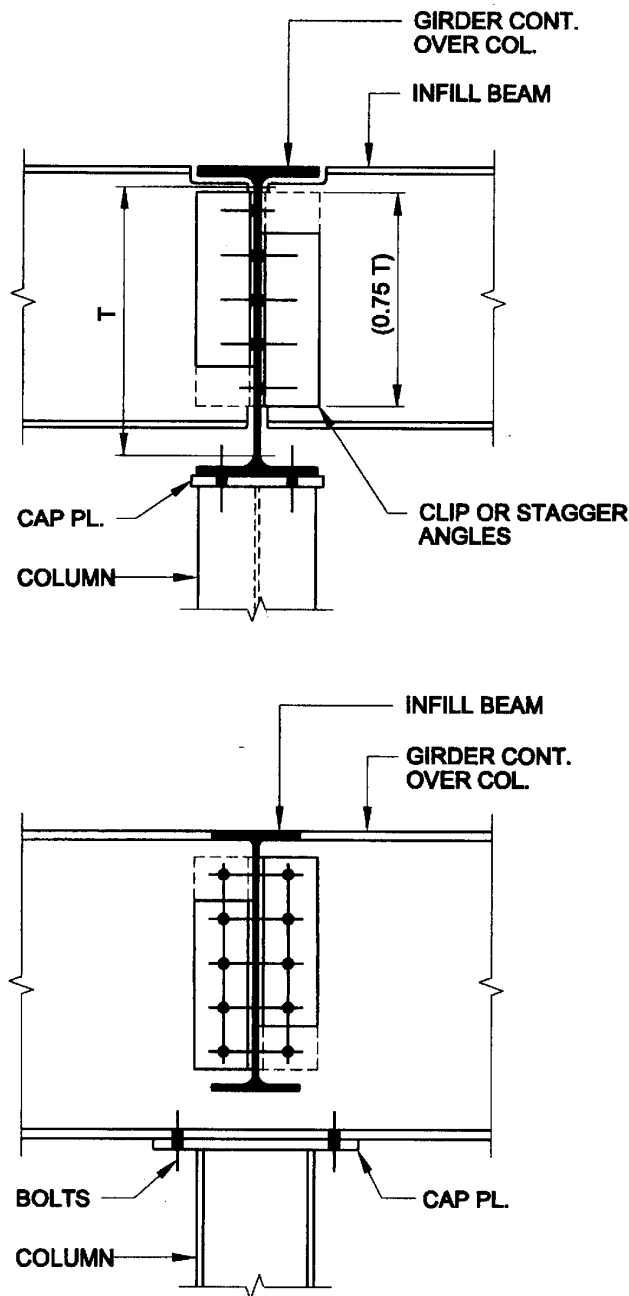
Beam framing continuously over column top, stability provided with connections of infill beams.
